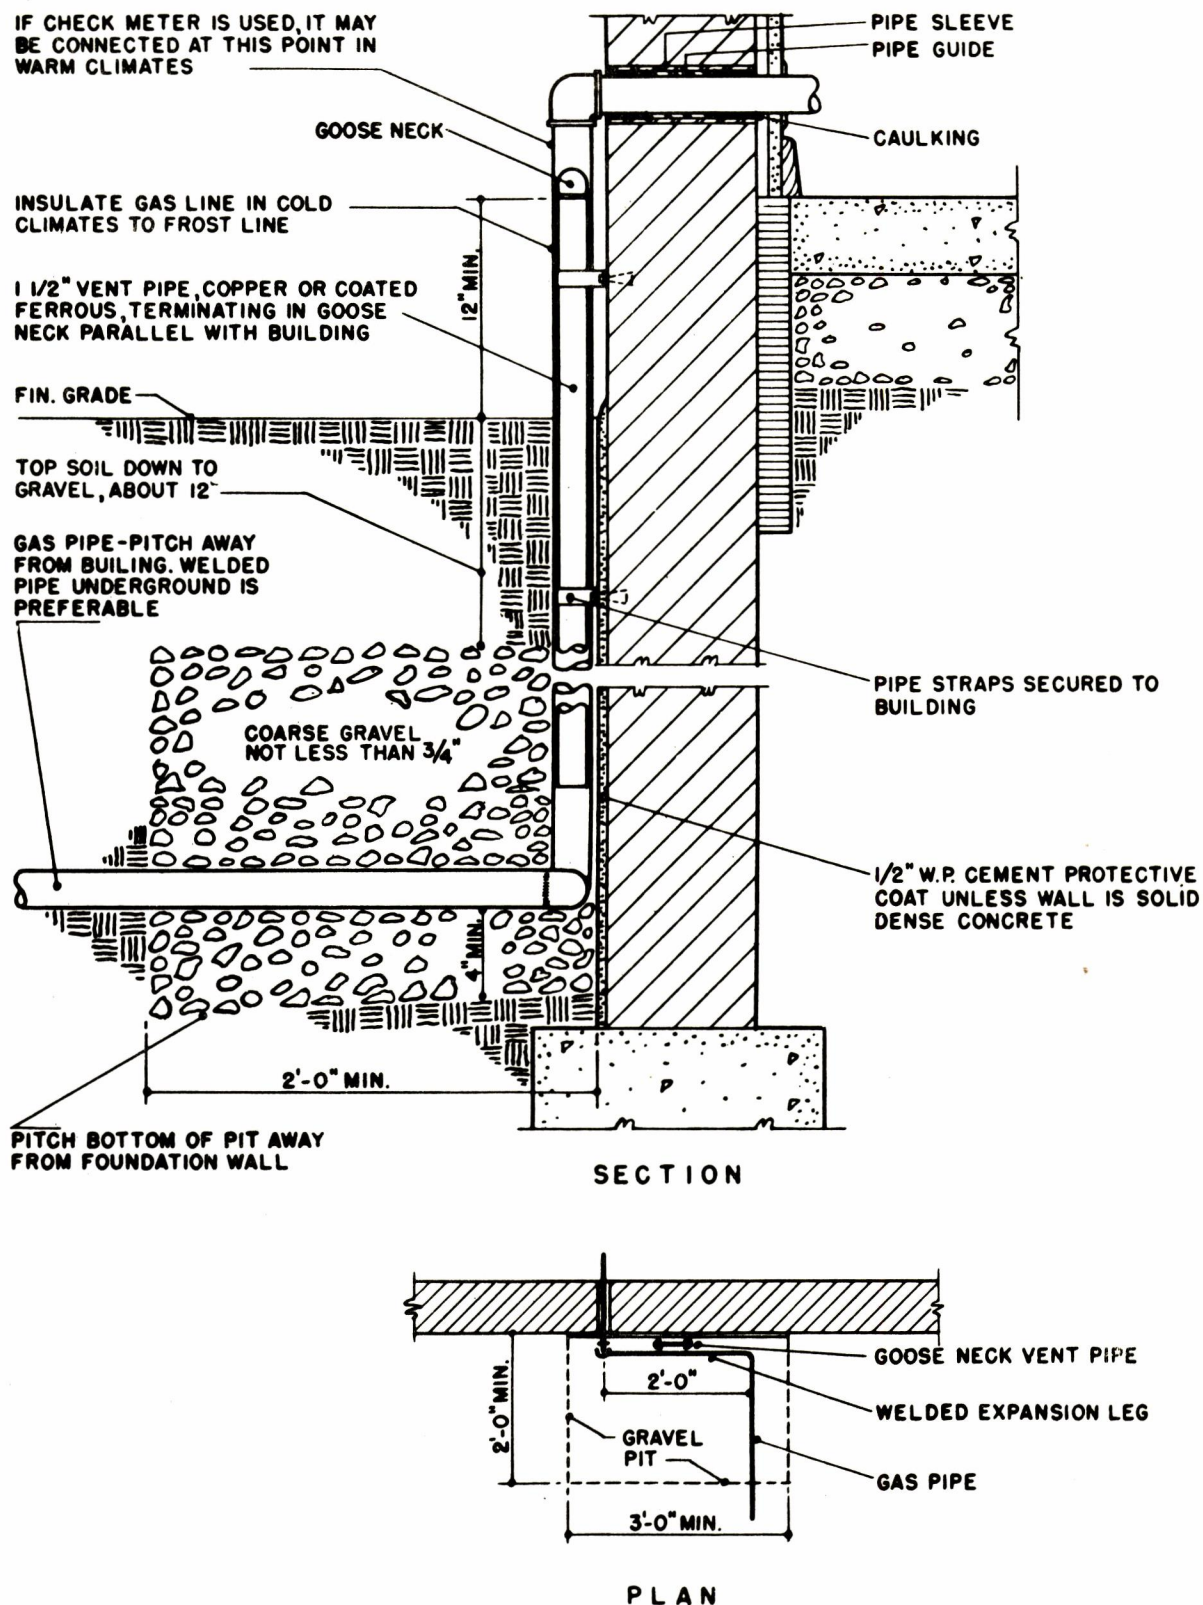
METHOD OF VENTING GAS PIPE TRENCH AT BUILDING ENTRANCE WITH SLAB ON GROUND CONSTRUCTION
